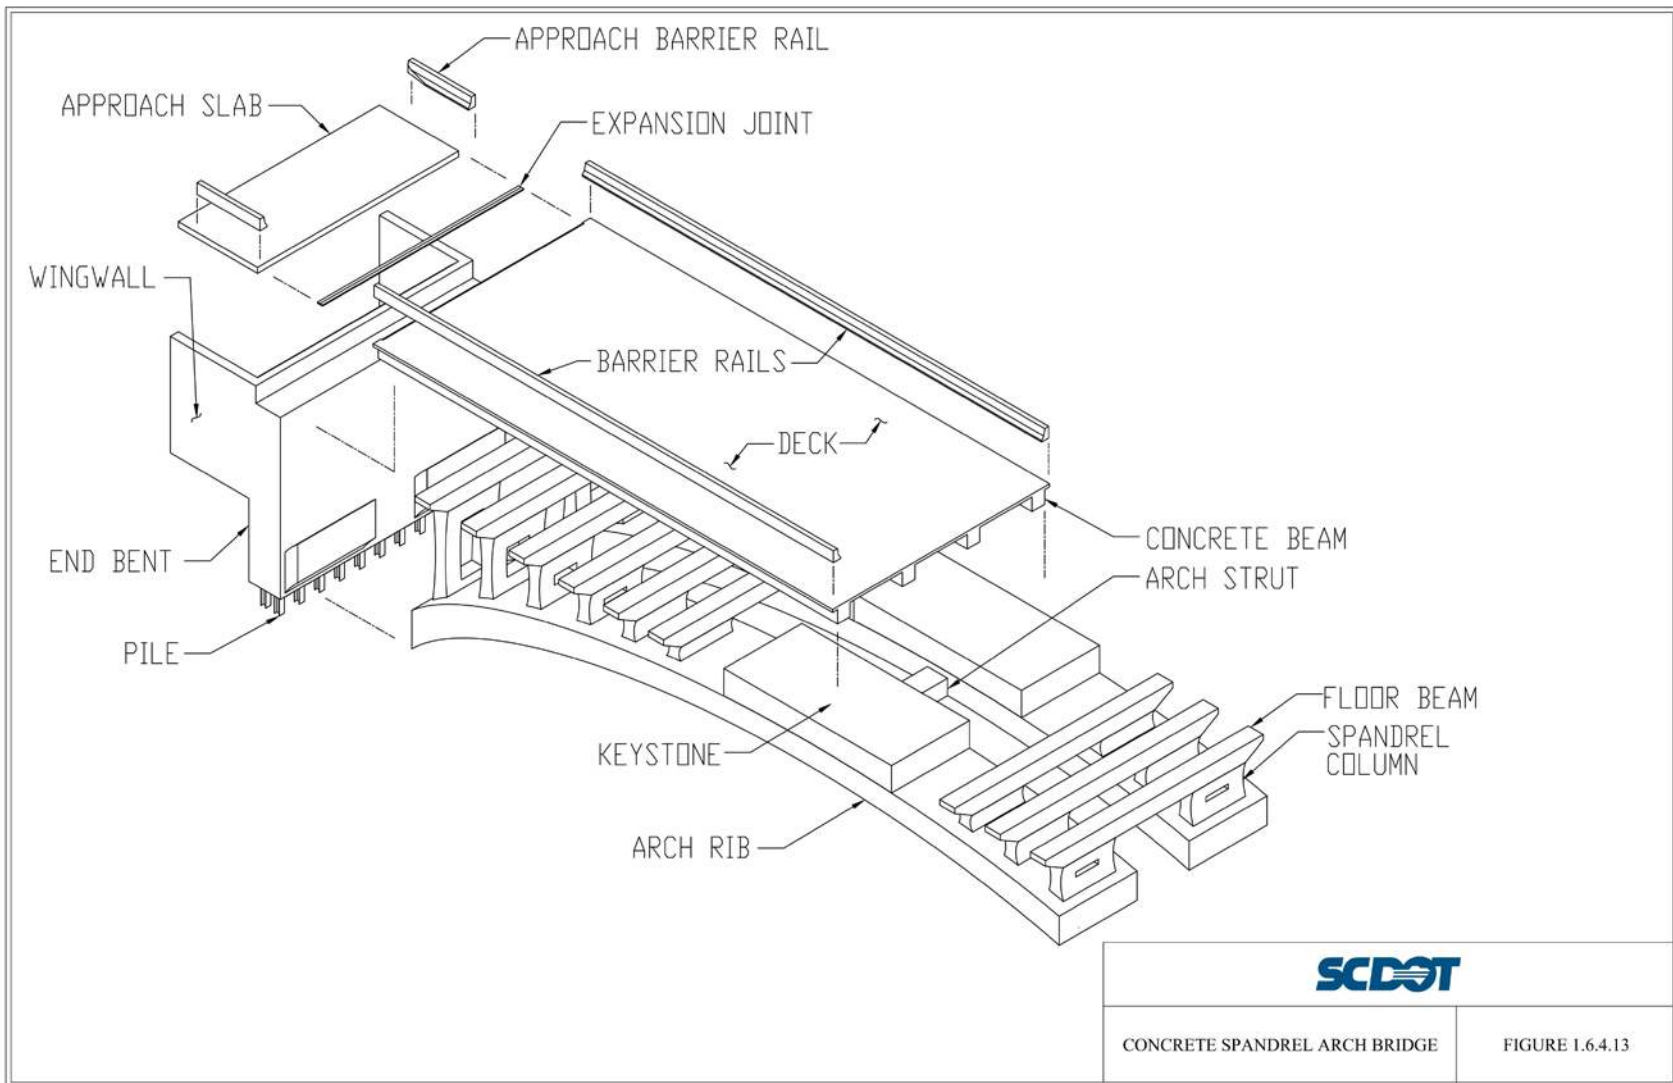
Concrete Spandrel Arch Bridge Components
